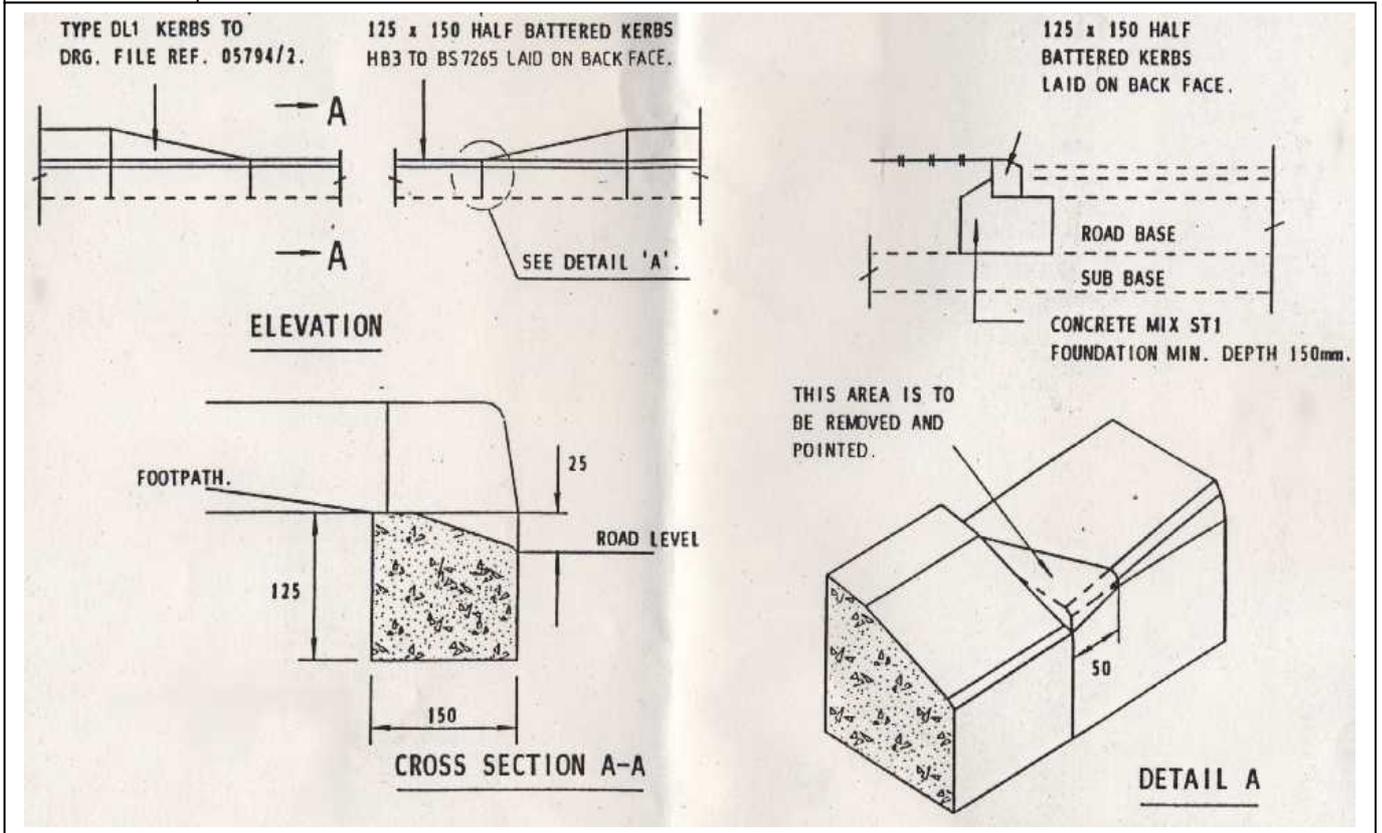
Detail of kerb layout for transition between carriageway and cycle track
